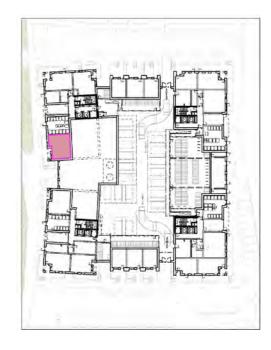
Typical 6 Bedroom 10 Persons Maisonette
